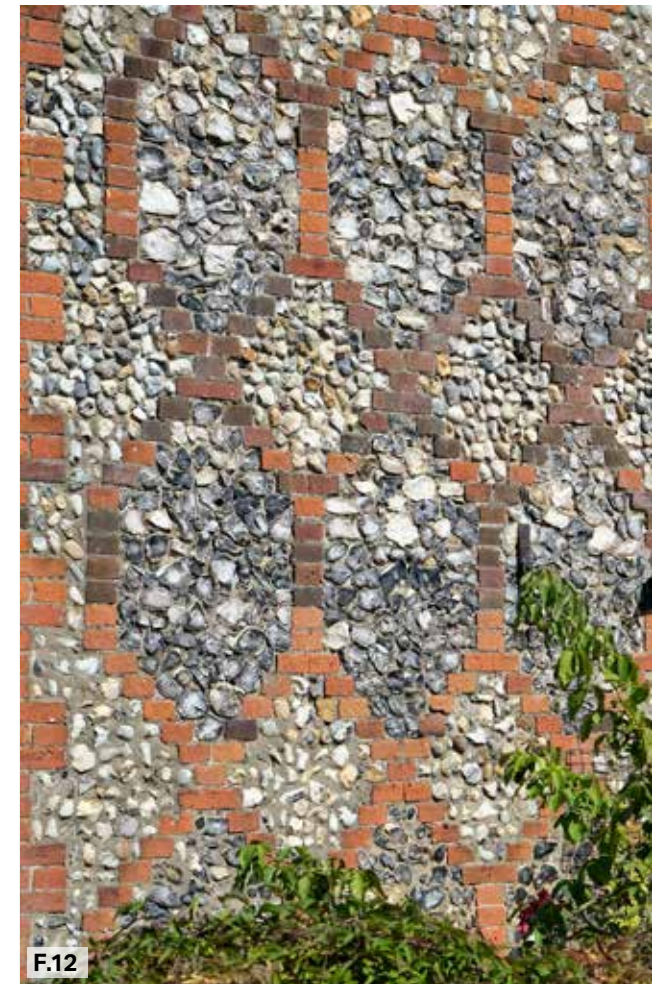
Materials and details make an impact on the quality of place, as seen by this beautiful wall in Hingham which demonstrates a lattice of flint and brick, typical of this area.
